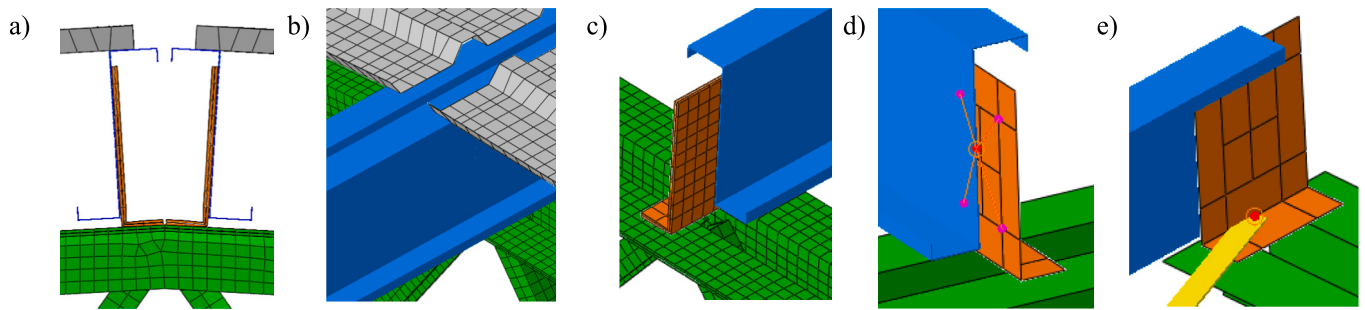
Details in numerical model: a) ridge with two purlins – view 1, b) ridge with two purlins – view 2, c) purlin-truss connection, d) coupling between angle cleat and purlin, e) tie between angle cleat and bar bracing. Note, that the Z-shape of the purlin and flat bar is just the visualization of the beam element cross-section.
